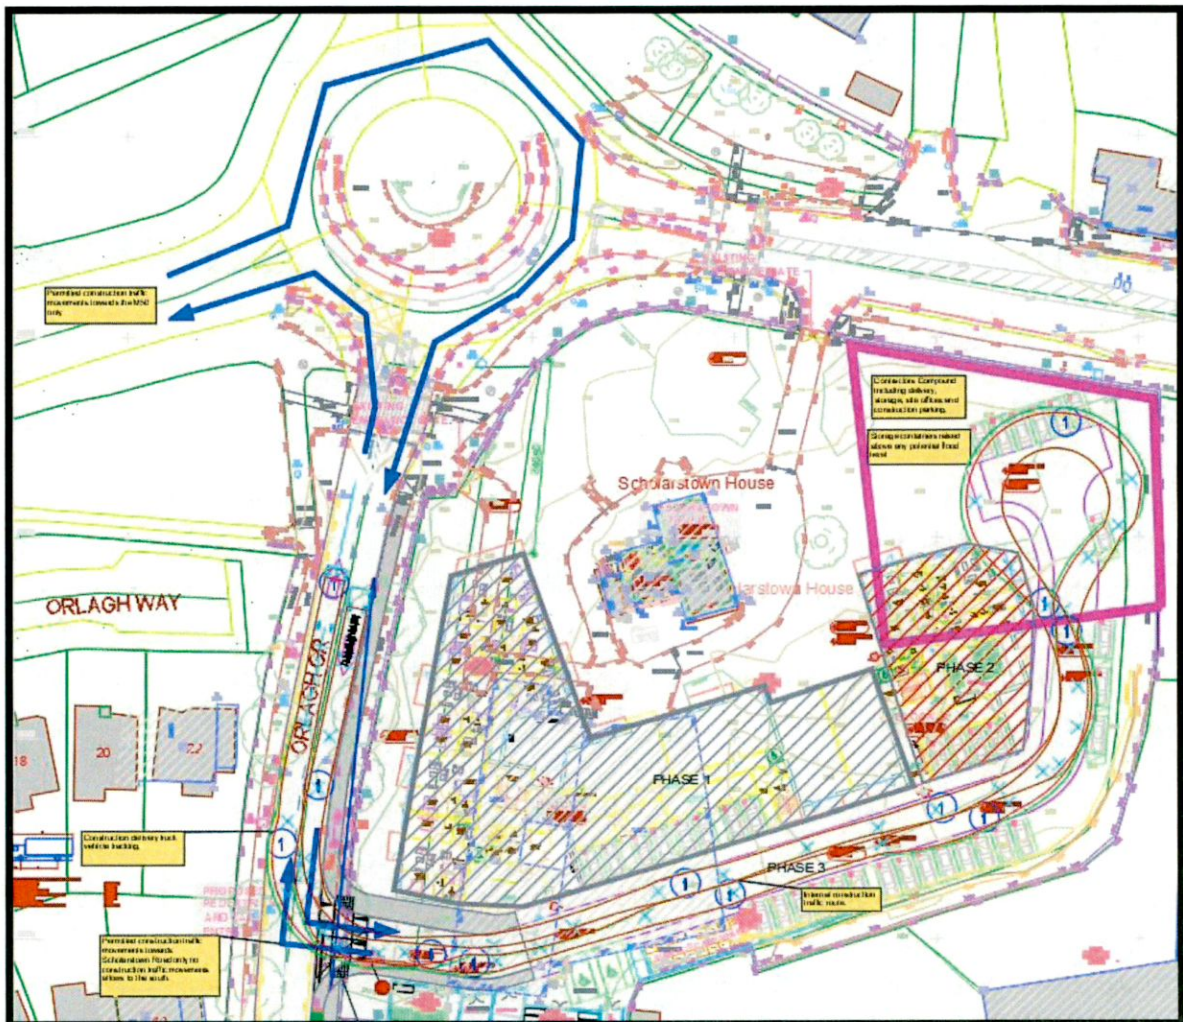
Proposed Construction Stage Haul Route for construction traffic
